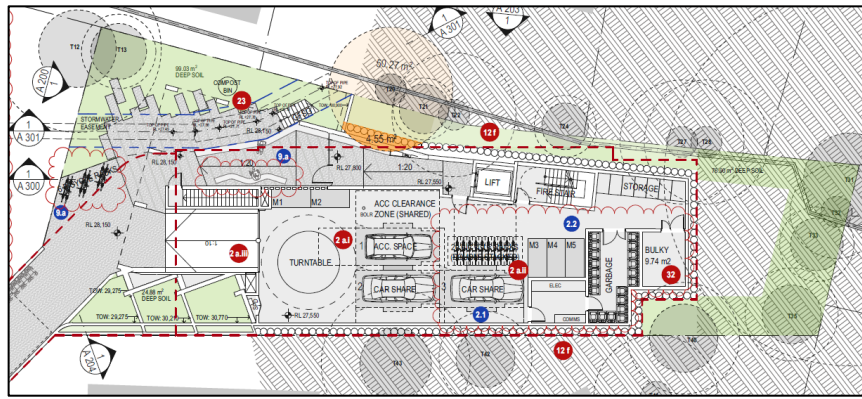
Proposed ground floor plan (Source: TonkinZulaikhaGreer)
